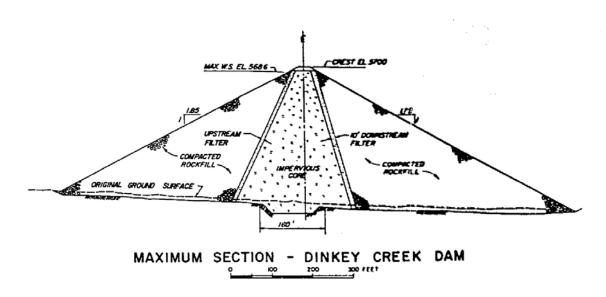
CROSS SECTION OF THE ROCKFILL EMBANKMENT
